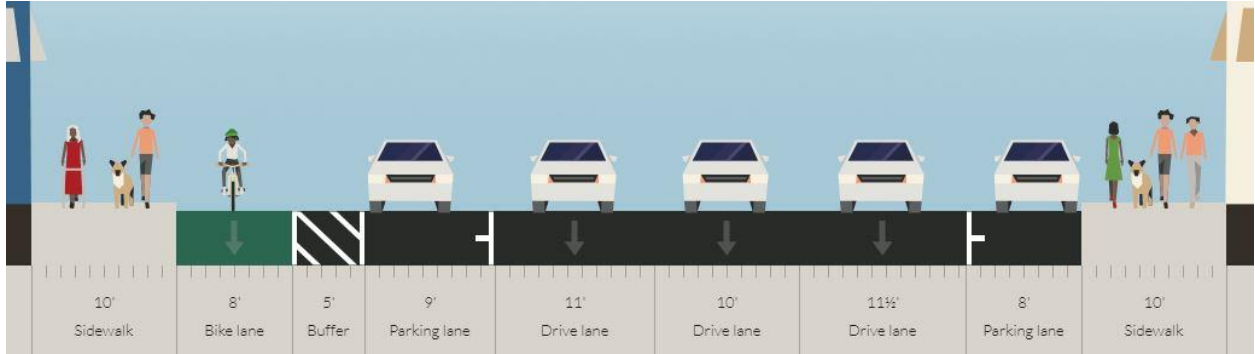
Section View between 11th Street and Falmouth, midblock, looking west
